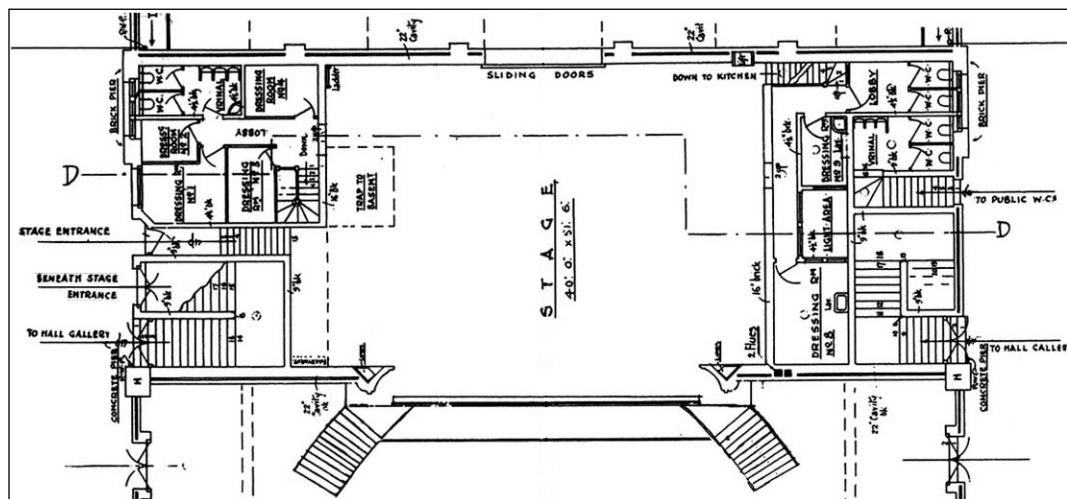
Detail of 1914 plan of stage area showing dressing room layouts (HCC Drawing A7²).
